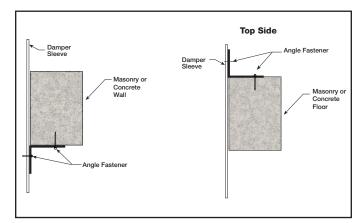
Single Side Angle With Masonry or Concrete Wall and Floor
